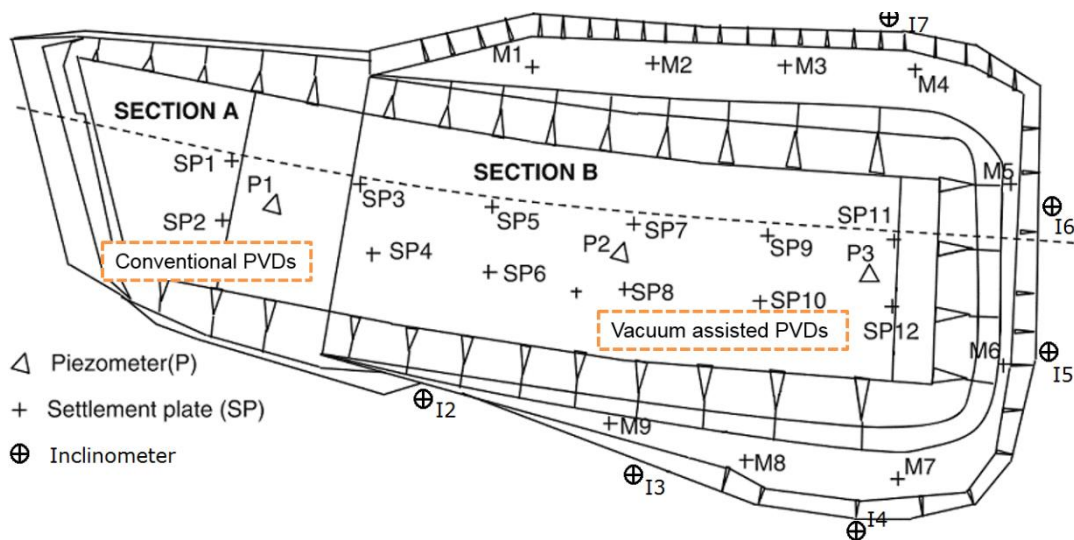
Layout of instrumentation (modified from Kelly and Wong, 2009).
